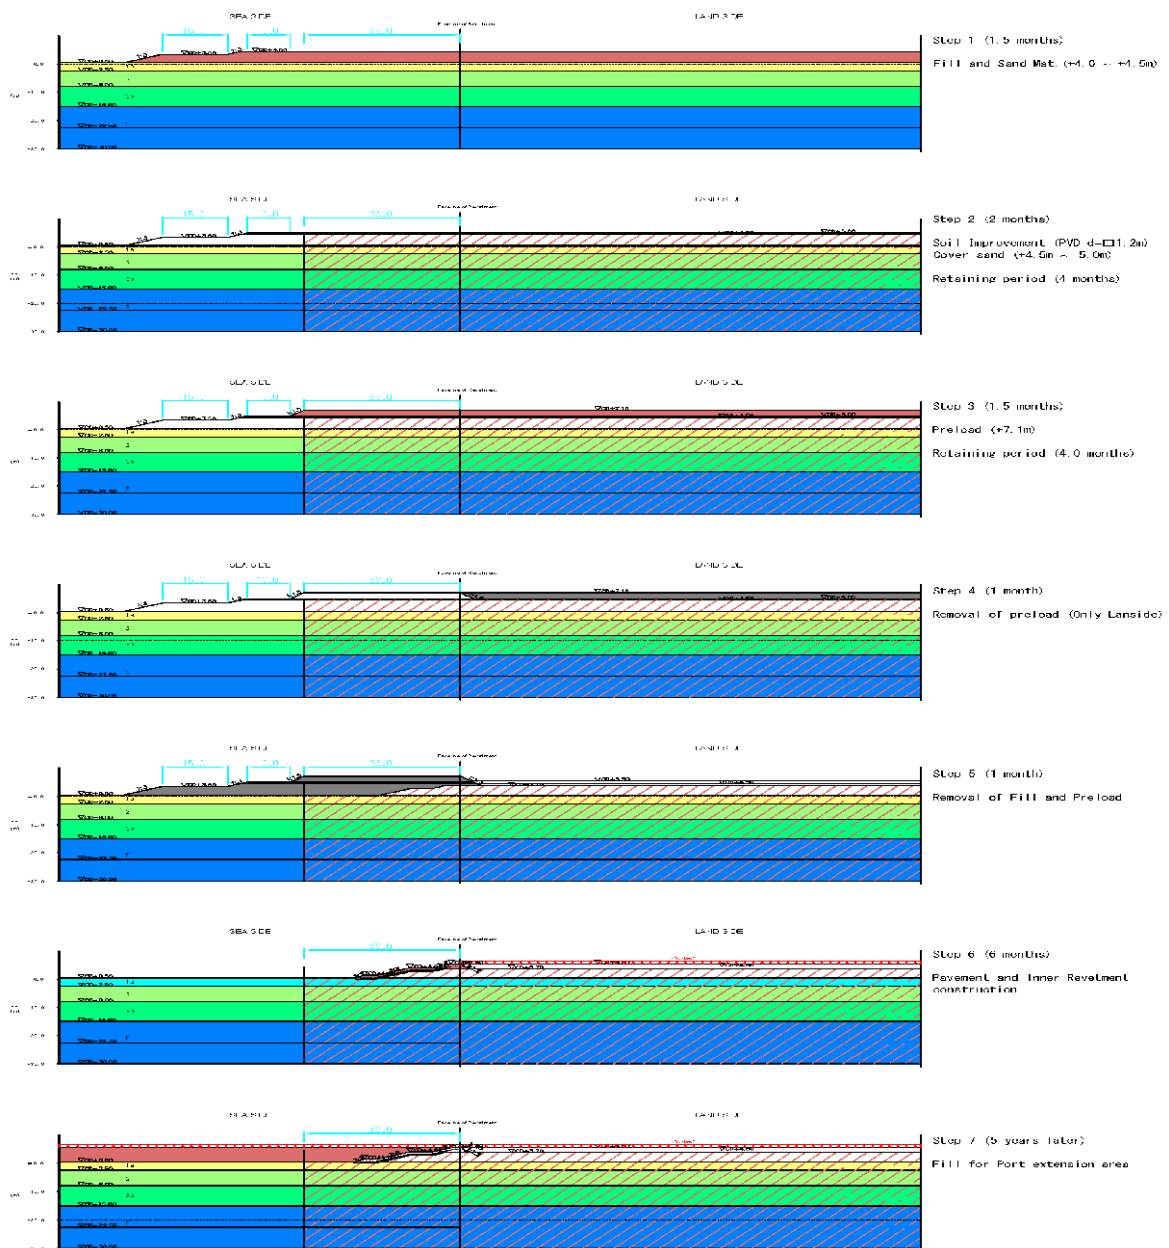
Analysis Steps based on assumed Construction Schedule for Section FEM-3 at Inner Revetment beside Empty Container Storage Yard
